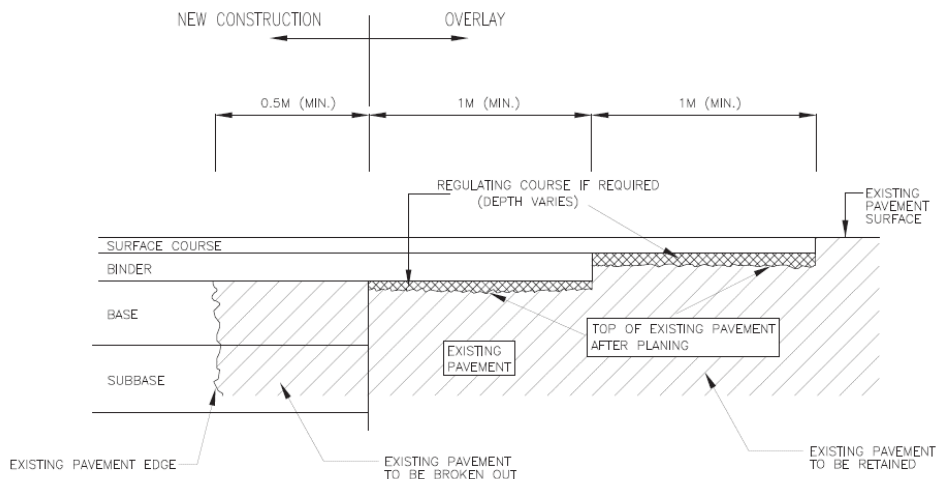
Transversal Joint between new construction and existing road as per CC-SCD-00704-03
